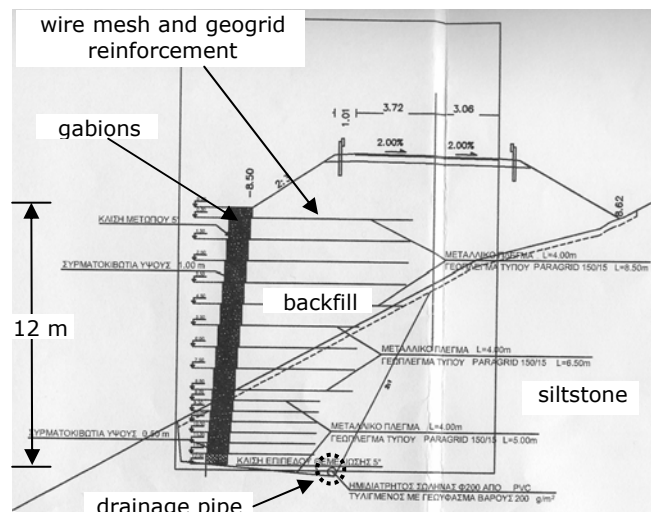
Cross-section of the reinforced wall and embankment considered in stability calculations.
